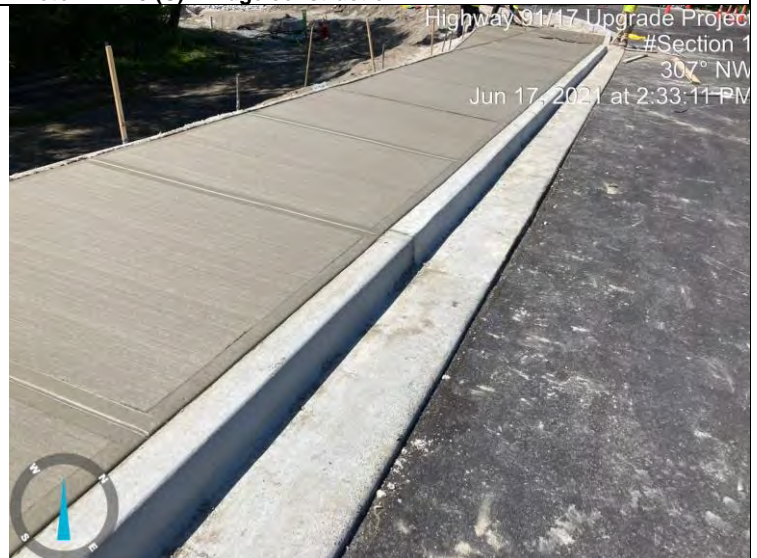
L350 (C). Sidewalk west of S1 roundabout.
